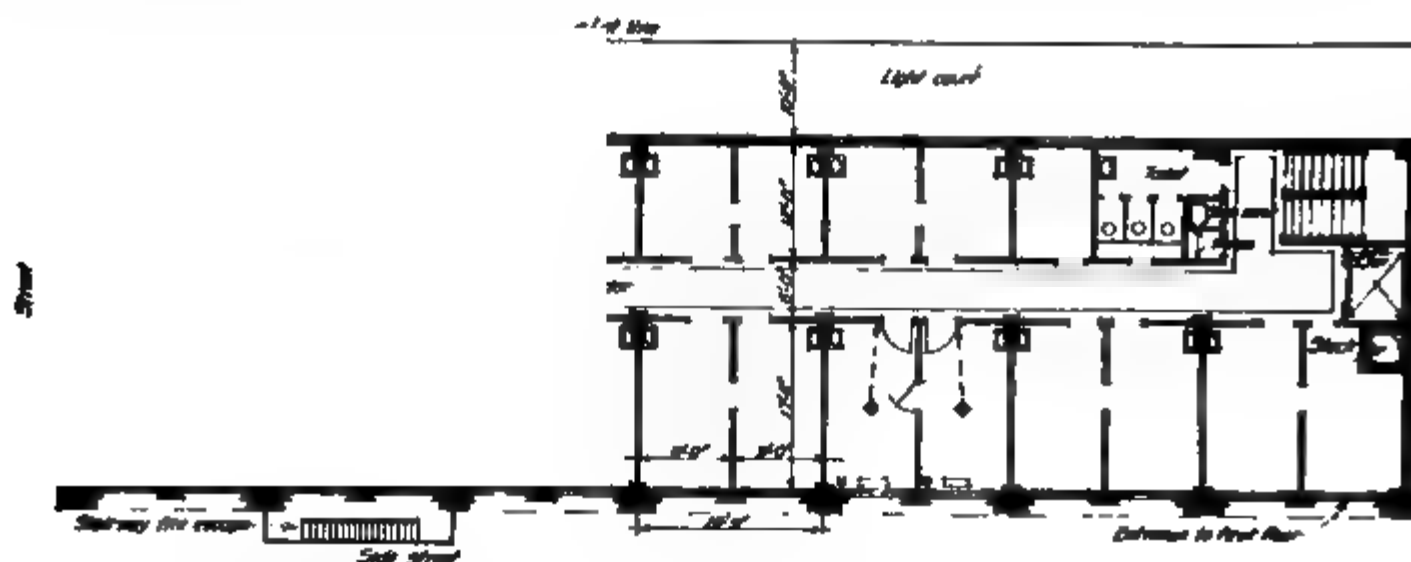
Typical floor plan of 4 or 5-story building on corner lot. Entrance on side street.
